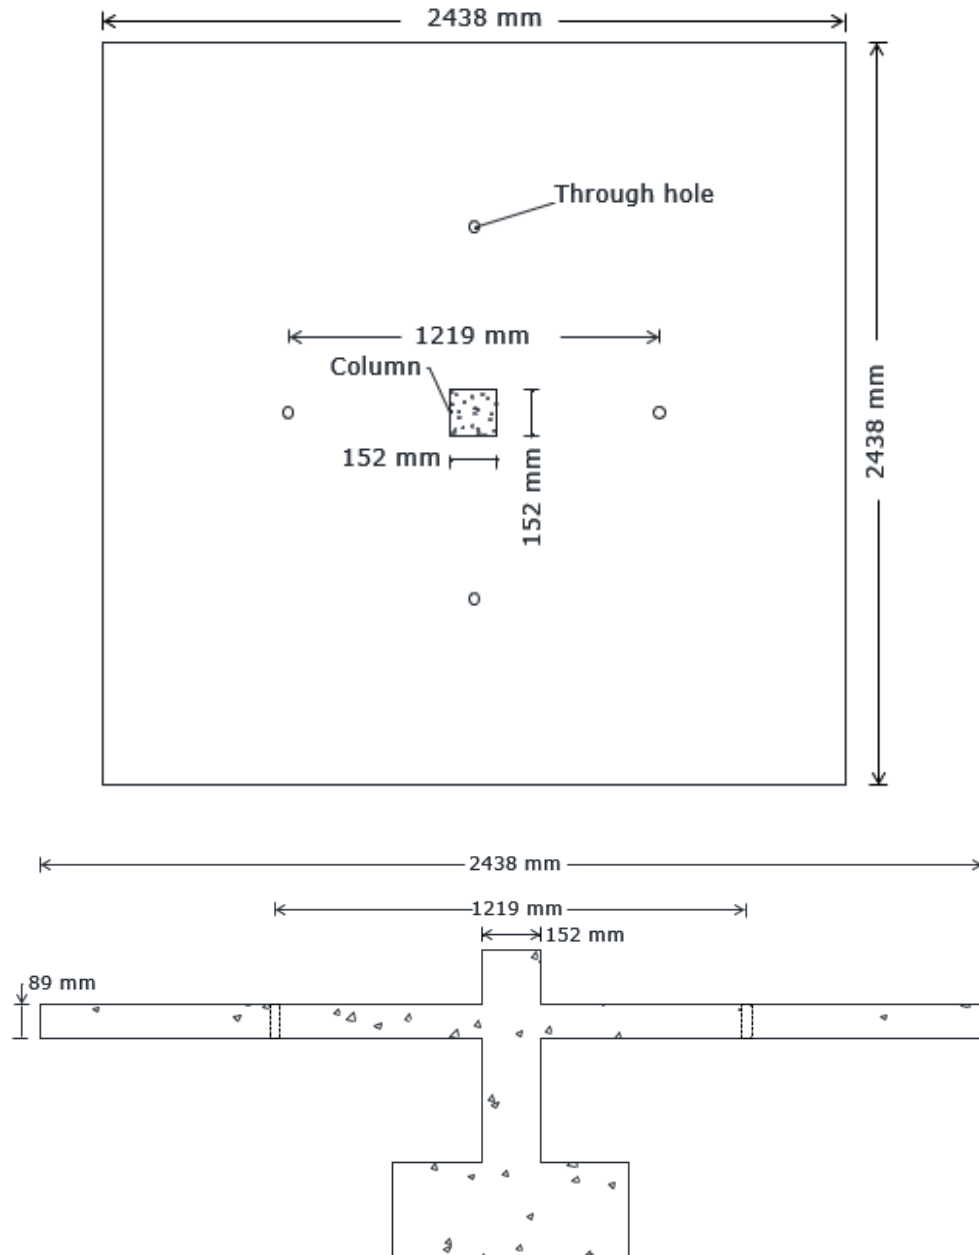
Slab specimen details: plan view (top) and elevation (bottom).
